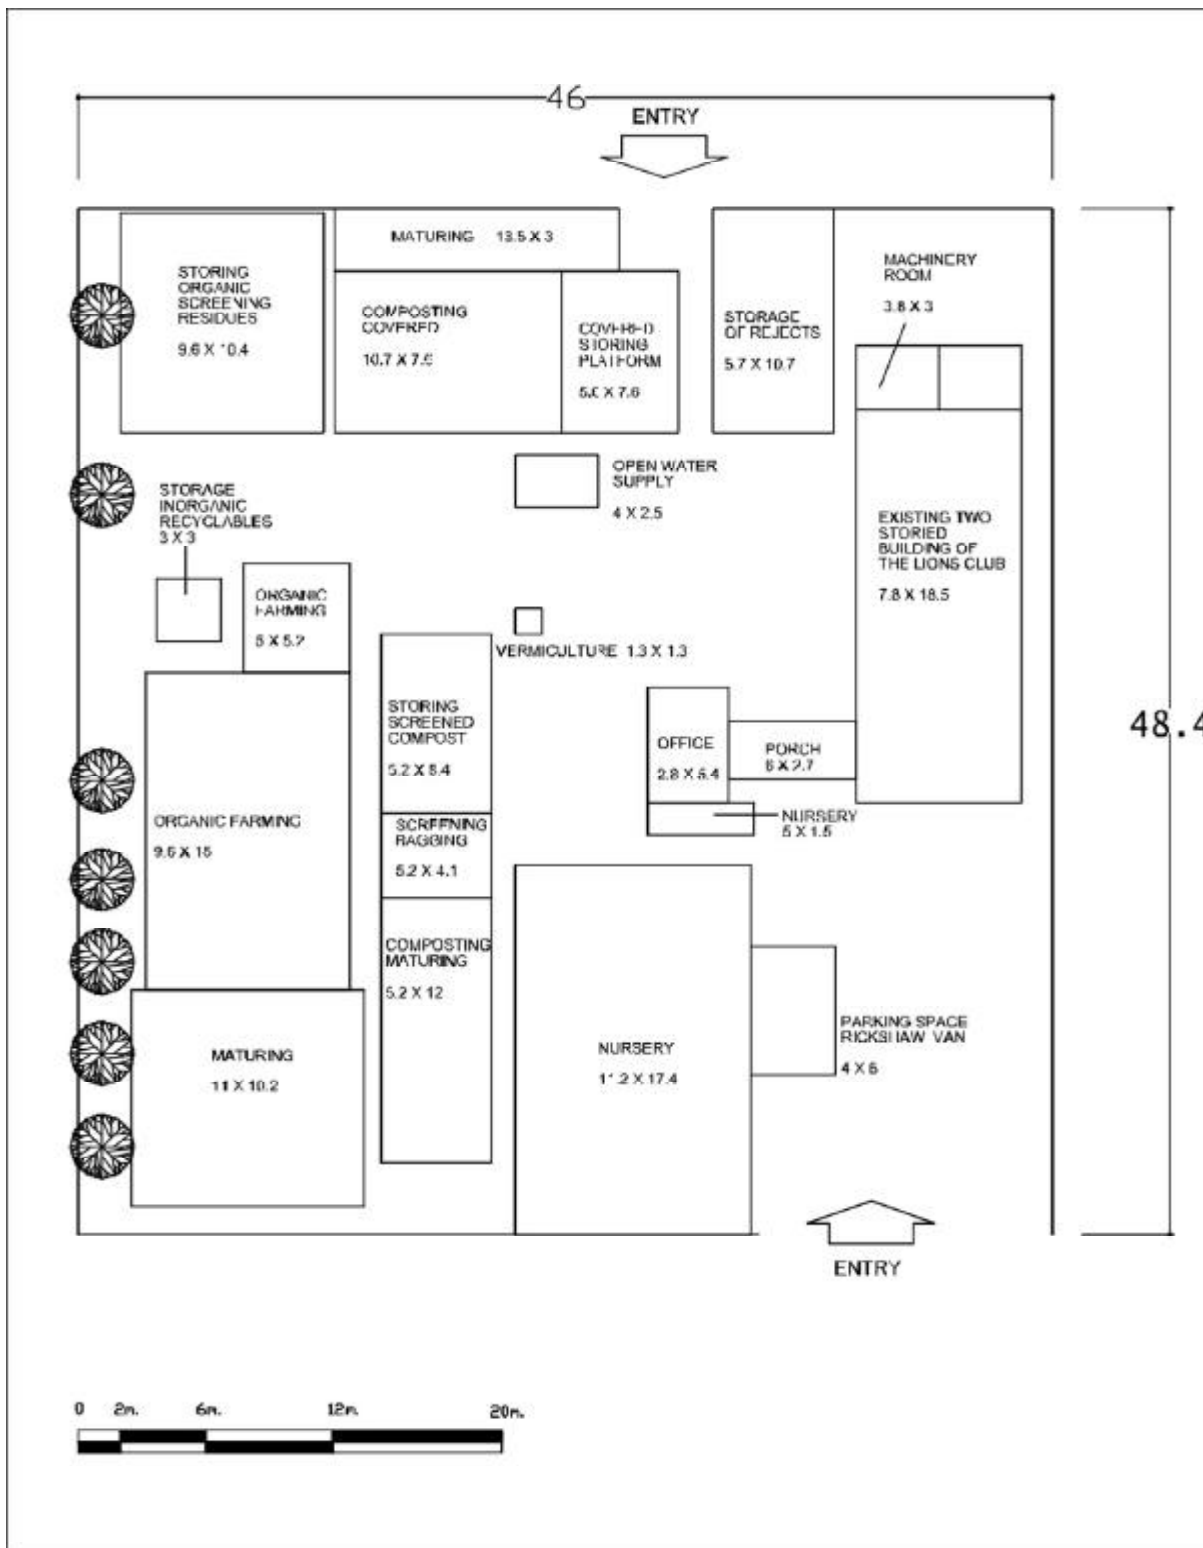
LAYOUT OF THE COMPOSTING PLANT
